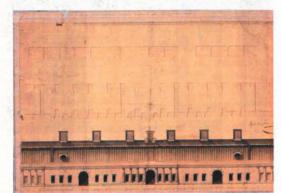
Plan and façade for the Silver smelting workshop of the State Barnaulian Factory, a drawing by Vasilii Zenkov, 1878.
